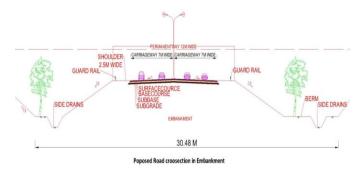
Cross section of Proposed Bypass Road in Embankment.
